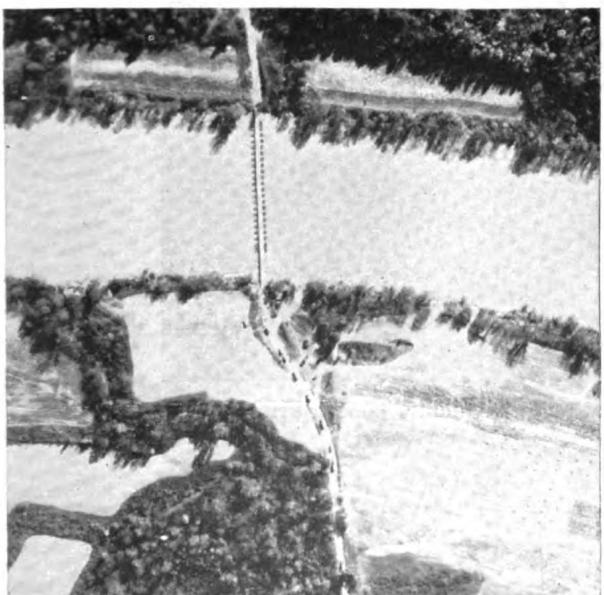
Scale 1:6,000: 10-ton ponton bridge constructed at a ferry site. Note large number of trestle bays necessary on each bank because of shallow water. Old bridge and ferry sites must always be considered as a possible ponton bridge site.
